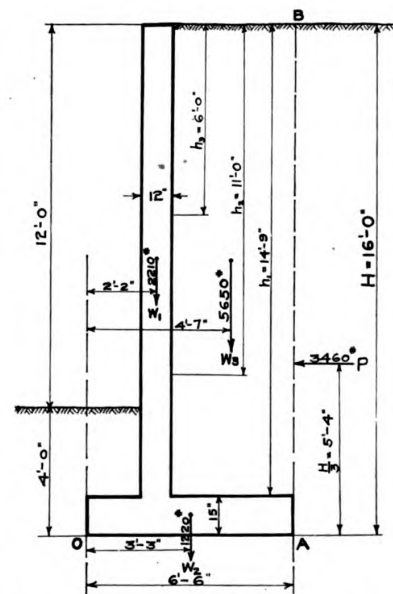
Assumed Conditions for a Reinforced Concrete Retaining Wall, 12 ft. high
